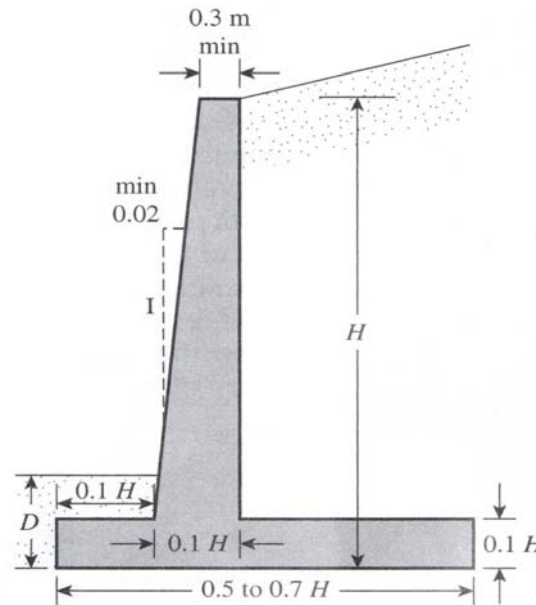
Terms used in conventional reinforced concrete cantilever retaining wall
